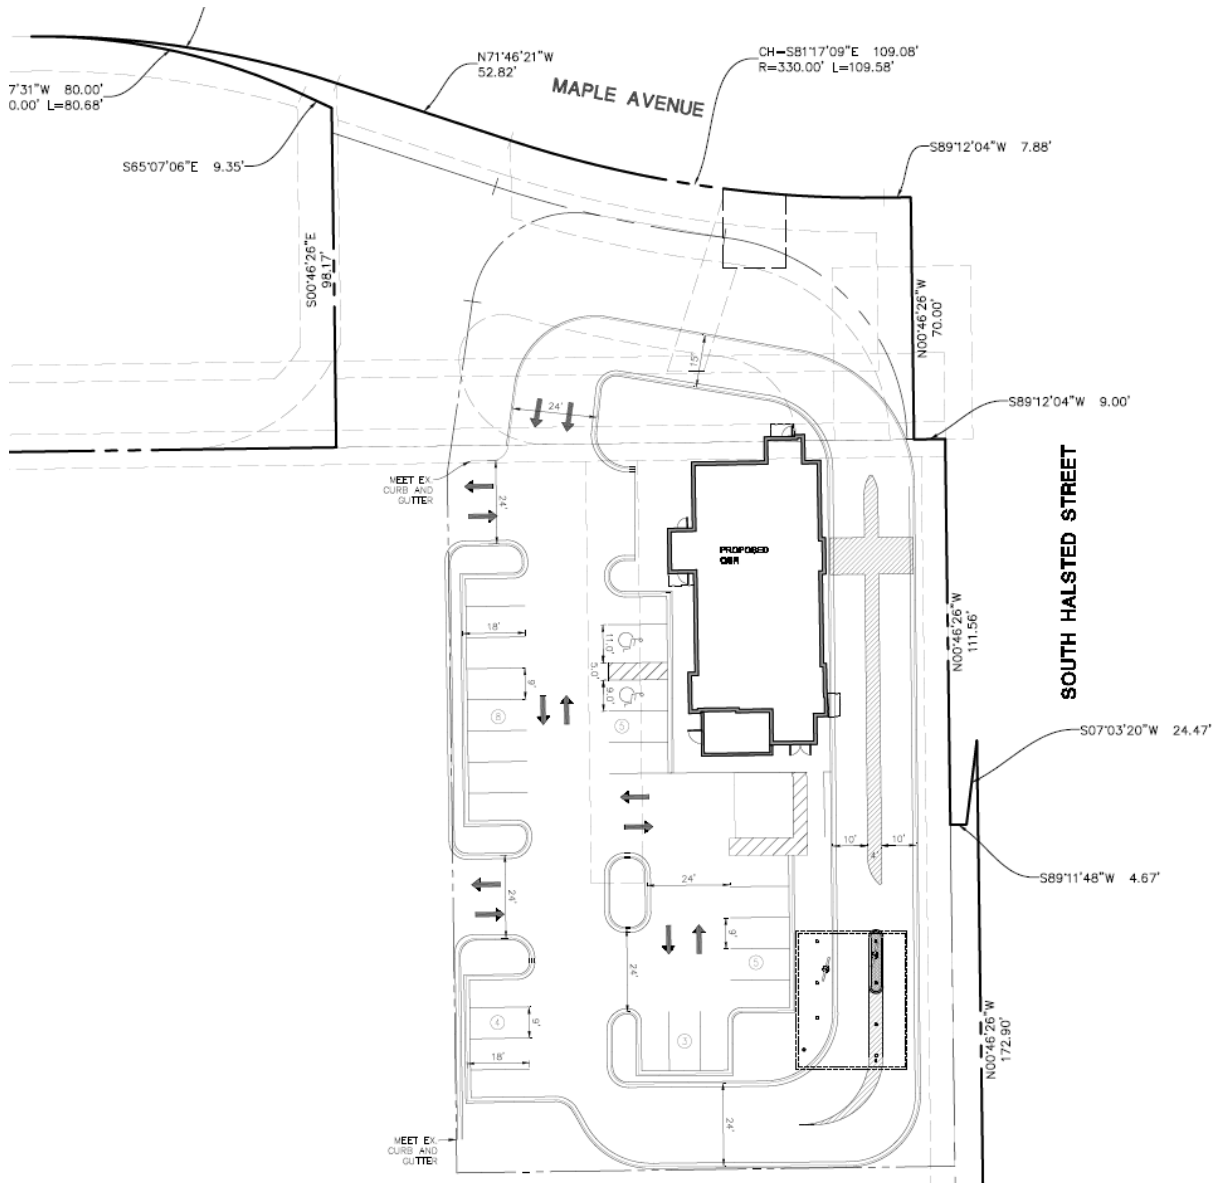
Conceptual site plan drawing submitted by the applicant, showing a potential scenario for a quick-service restaurant (QSR).
